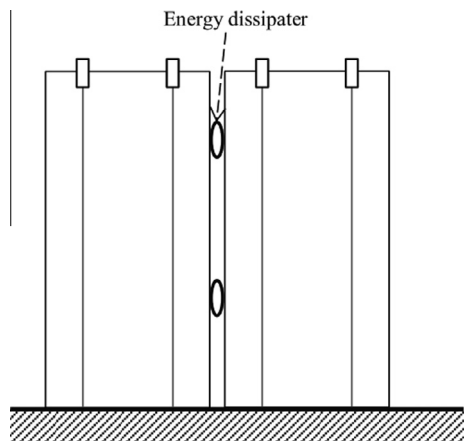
Schematic illustration of coupled post-tensioned timber shear walls.
